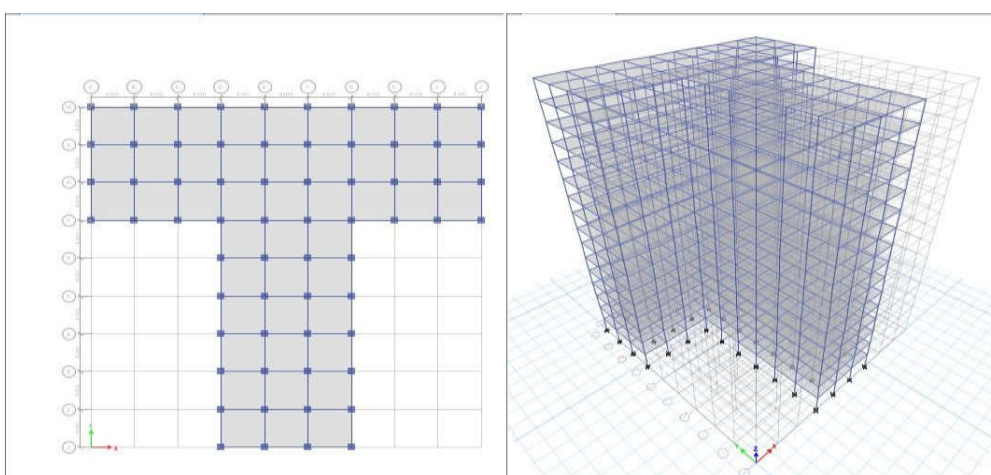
Assigning Beams, Columns, Slab to T Shape Building
